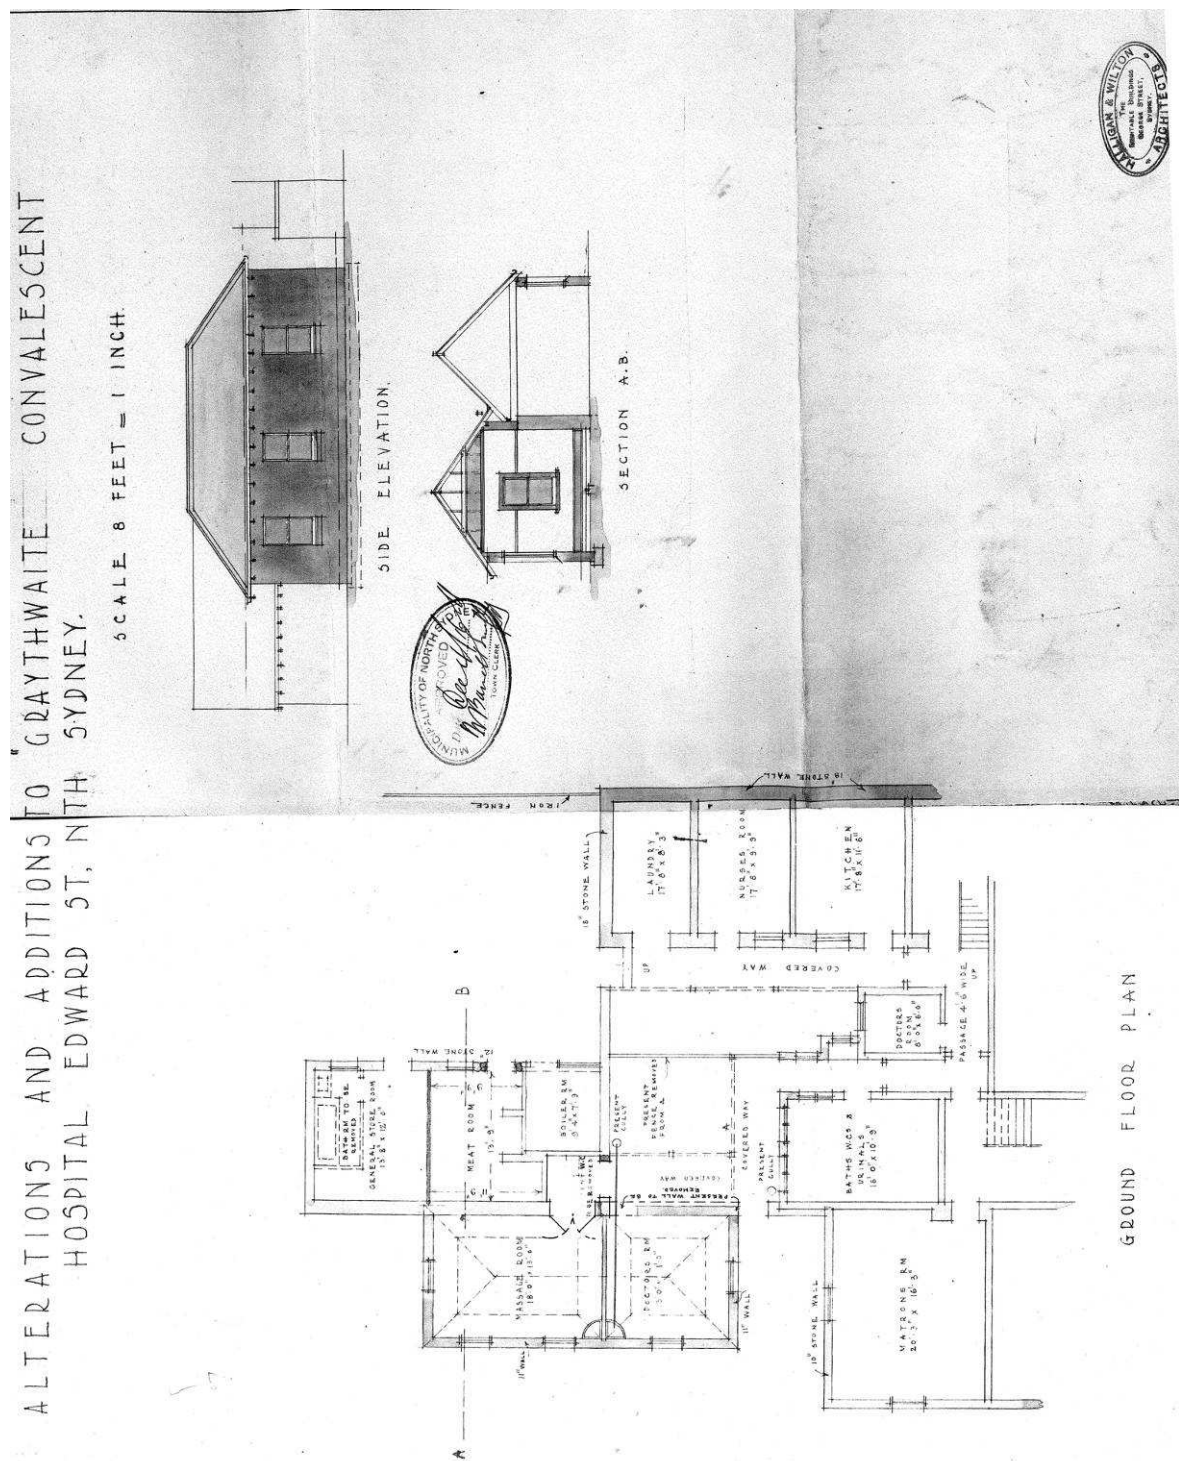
The plans for the building that housed the massage room and doctor's room.
